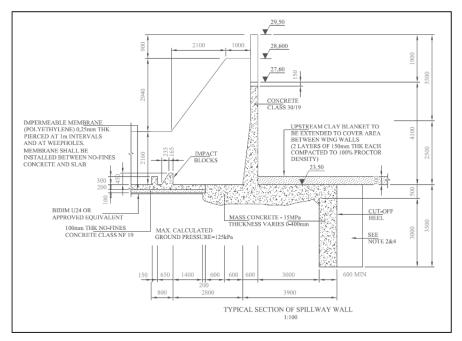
Zeekoegat WWTW outlet section of spillway wall
